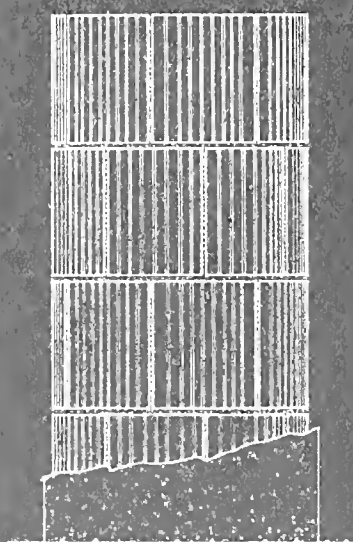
DETAIL OF HOLLOW TILE PIERS WITH STVCCO COVERING
